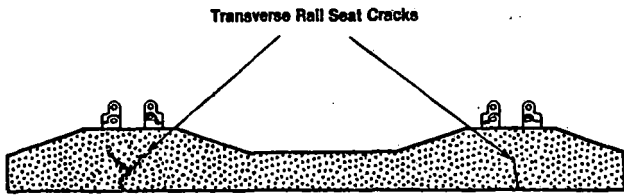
CONCRETE TIE TRANSVERSE RAIL SEAT CRACKS
